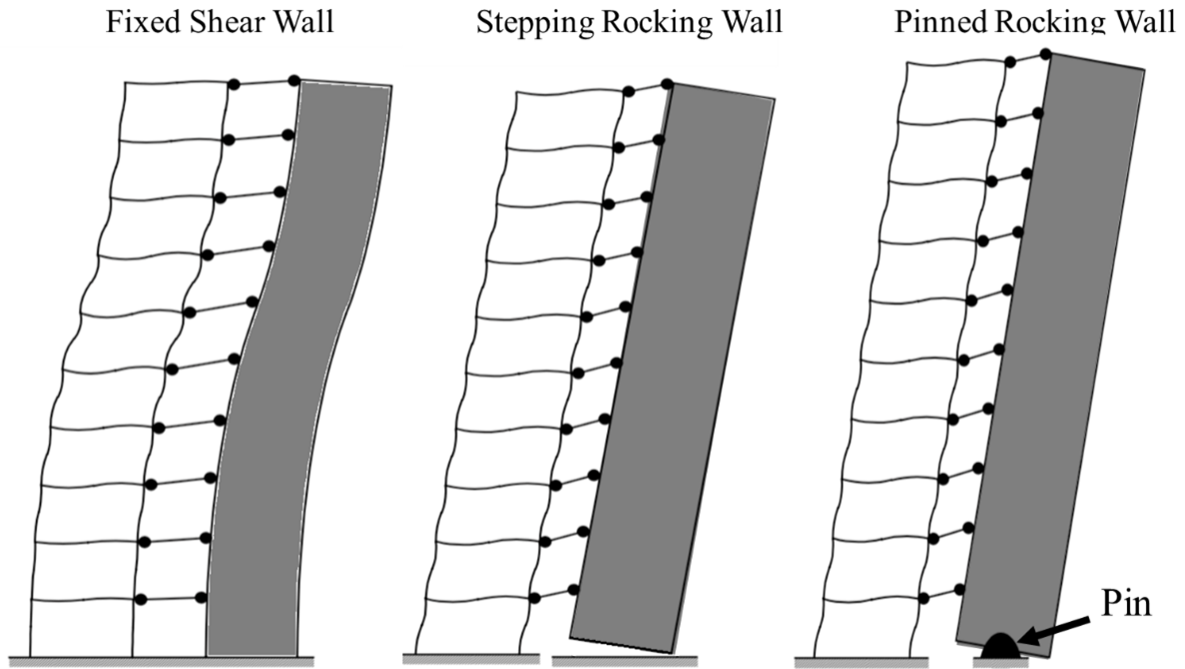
Conventional Fixed shear wall (left) compared to stepping rocking wall (center) and Pinned rocking wall (right).
